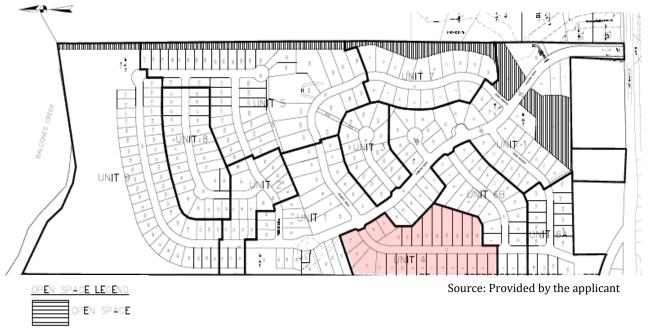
Exhibit C: Elkhorn Ridge Subdivision Master Plan (Unit 4 Highlighted)
